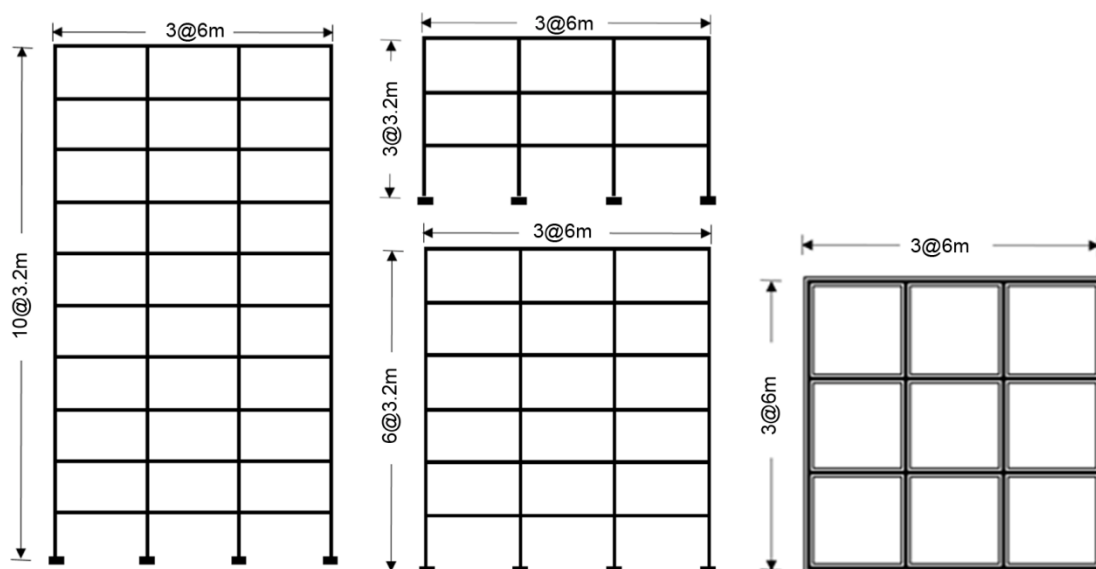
General plan and elevation for 3-, 6- and 10-storey archetypes RC structures.
